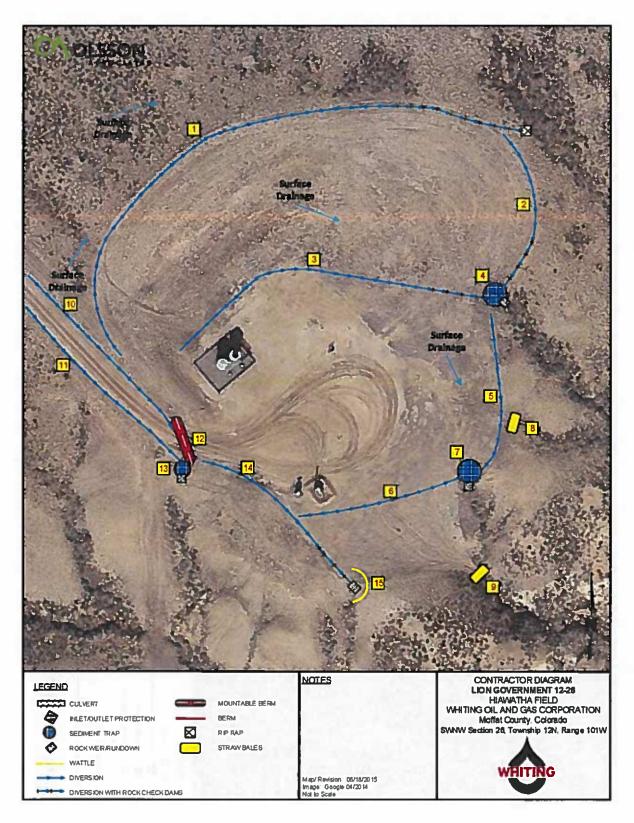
Diagram depicting stormwater features proposed for construction on Lion Government 12-26.
